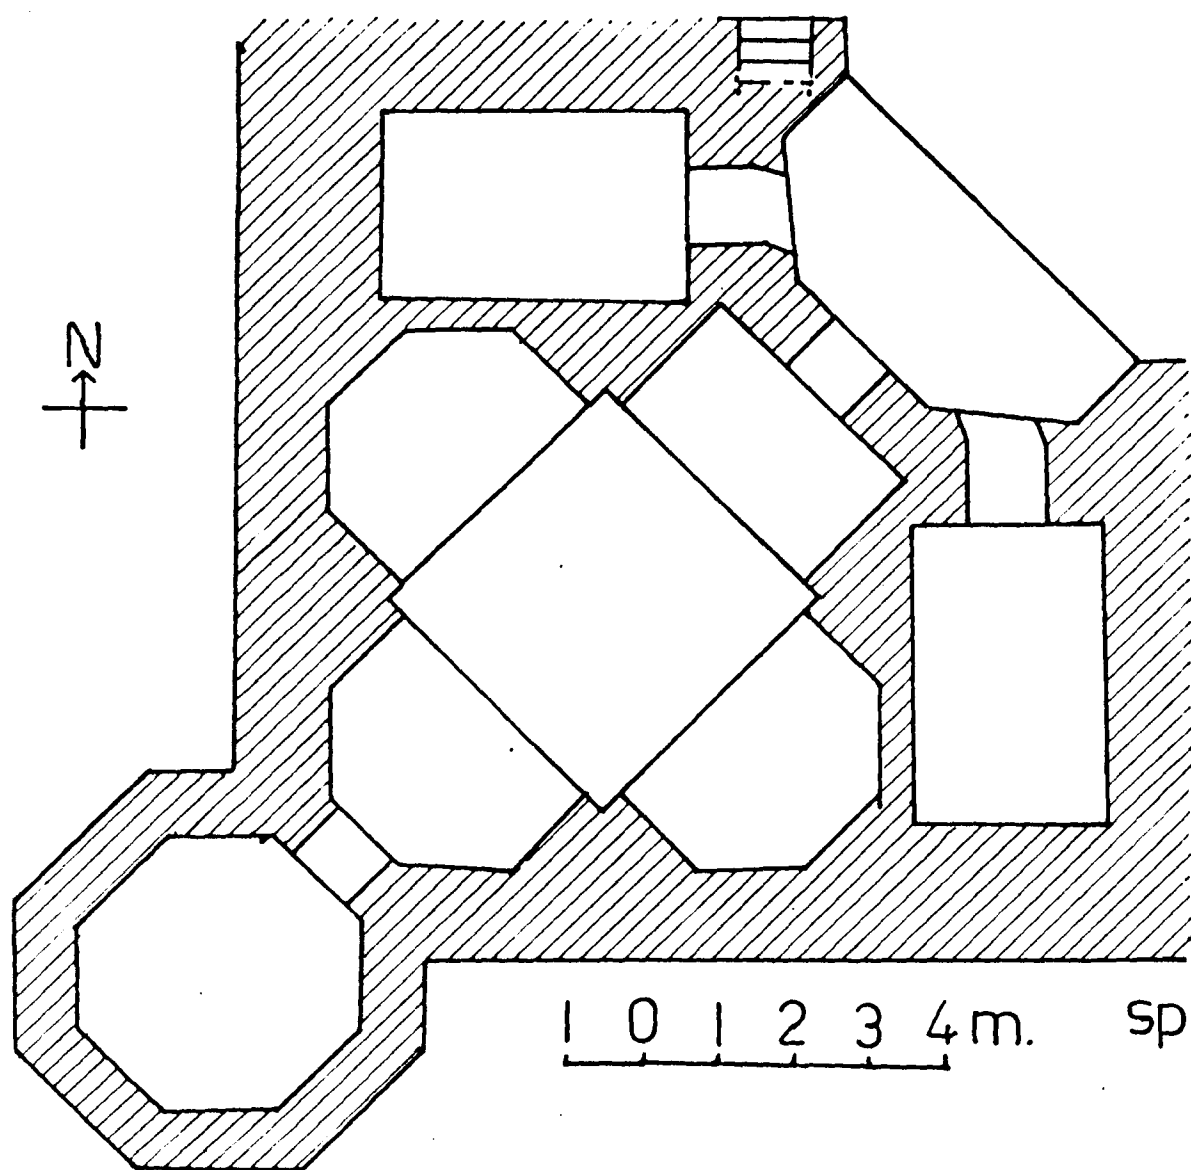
Fig. XI. Nurmahal : Sarai, plan of the rooms in the southwest corner
